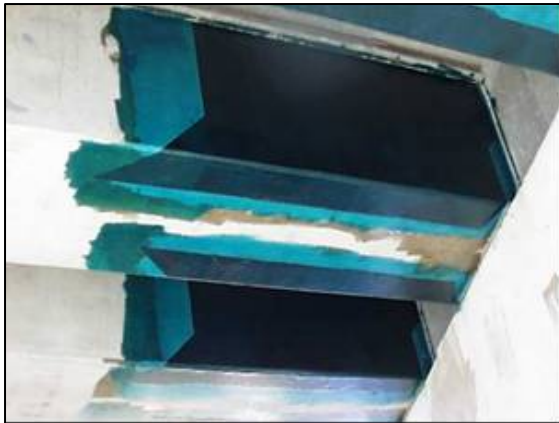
Placing CFRP fabric onto the concrete surface.
